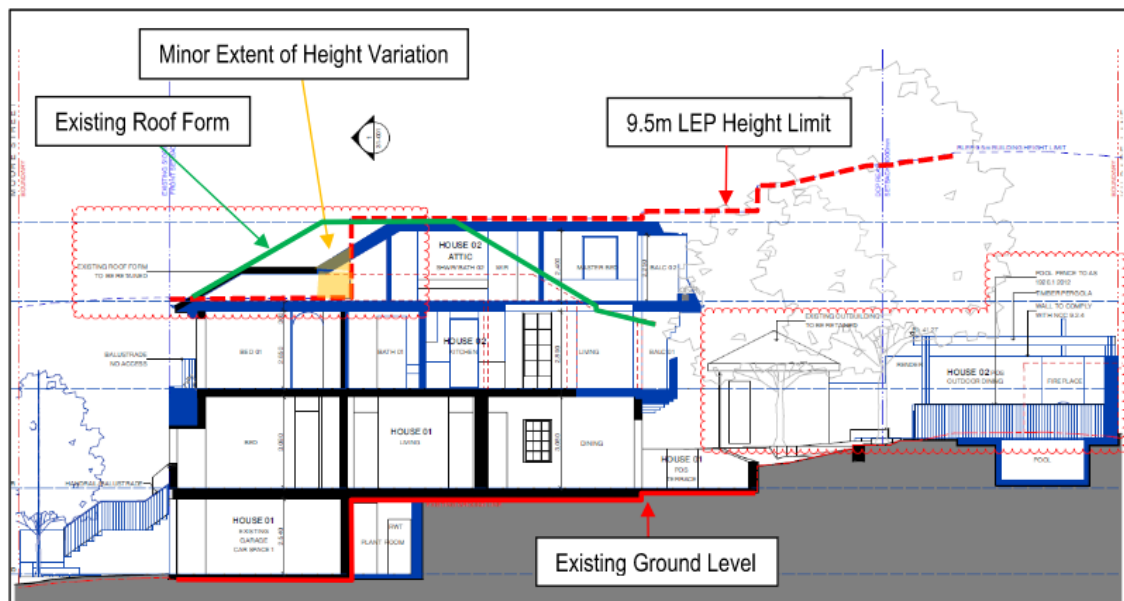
Existing and proposed building height – long section (Source: GSA Planning)
